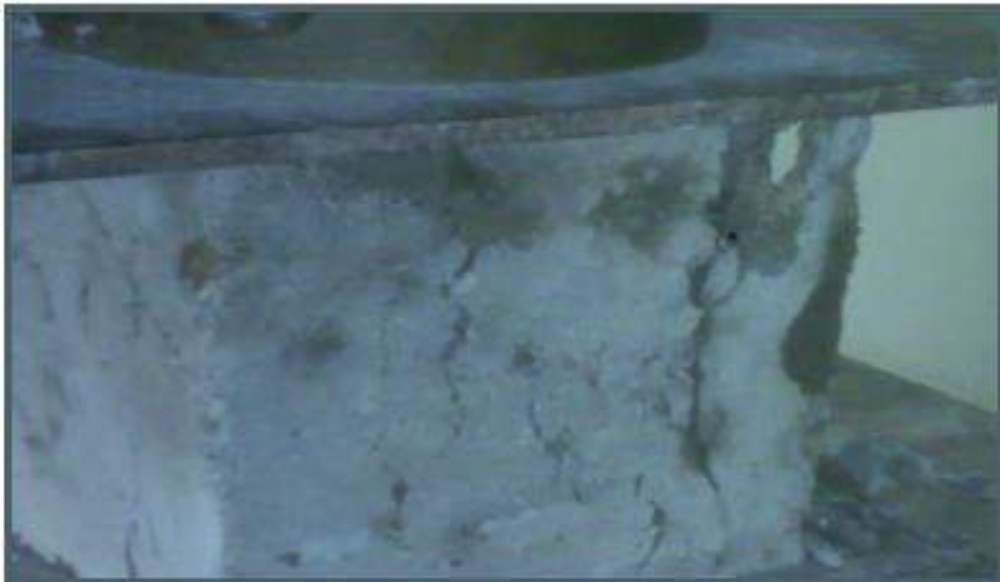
Failure of concrete cube (Source: Concrete lab LPU)
